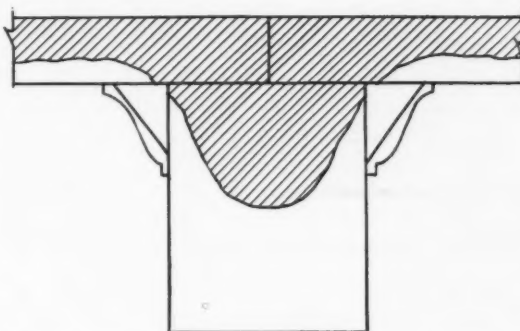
Section through roof plank showing effect of a moulding in bringing the moisture line, limiting fungus growth, outside the edges of the supports, resulting in the rotting off of the ends of the planks.
